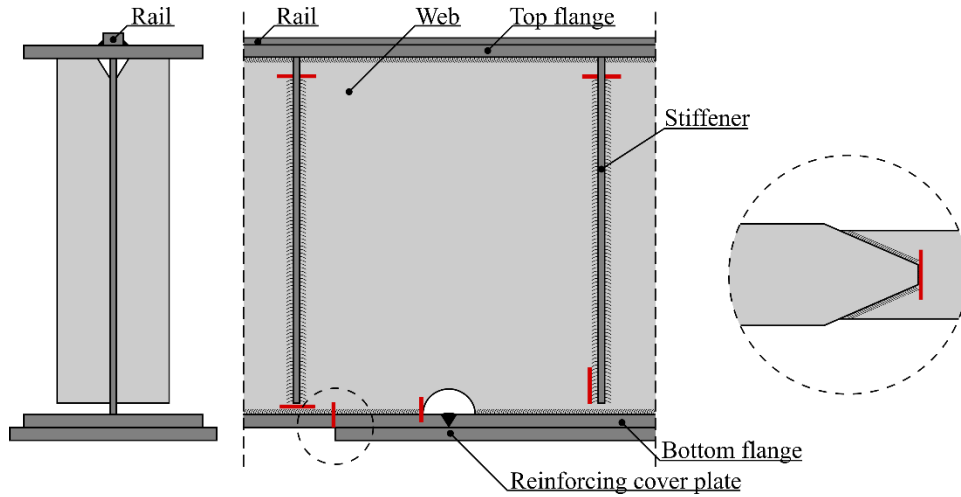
Typical crack locations (in red) in a welded crane runway girder, based on [34].
